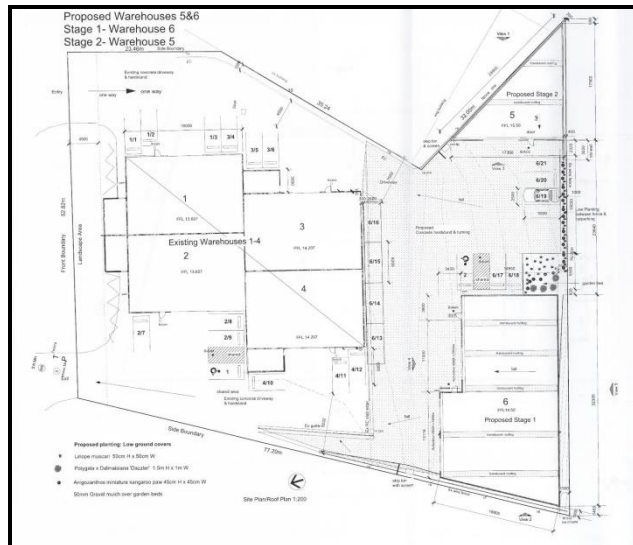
Site plan of 6 Whitestone Drive, Granton.
